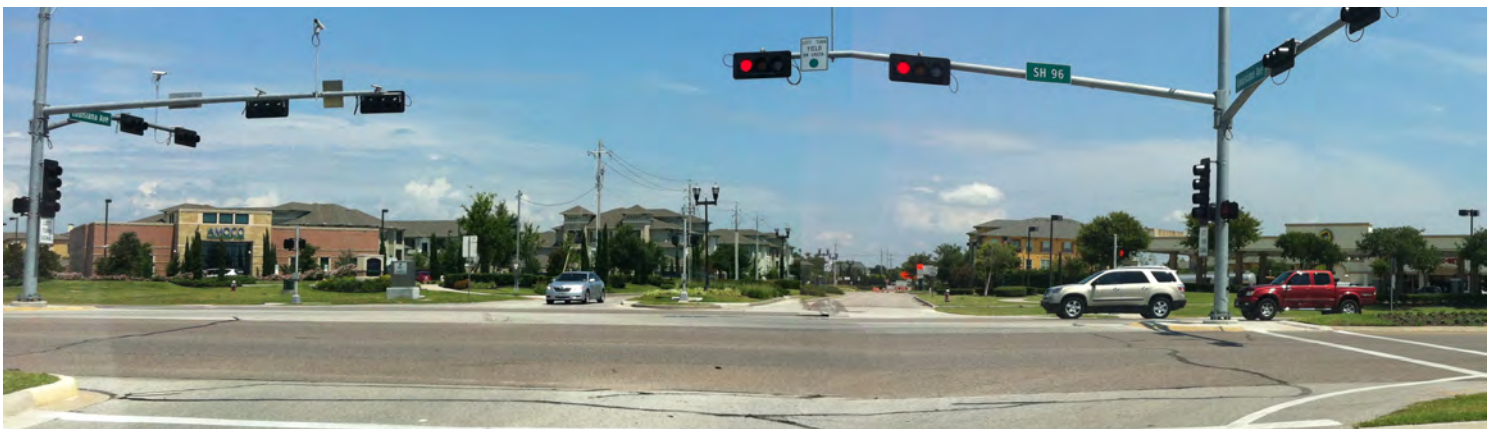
Louisiana Avenue and League City Parkway intersection. The proposed Master Plan site will be accessed from this intersection.
